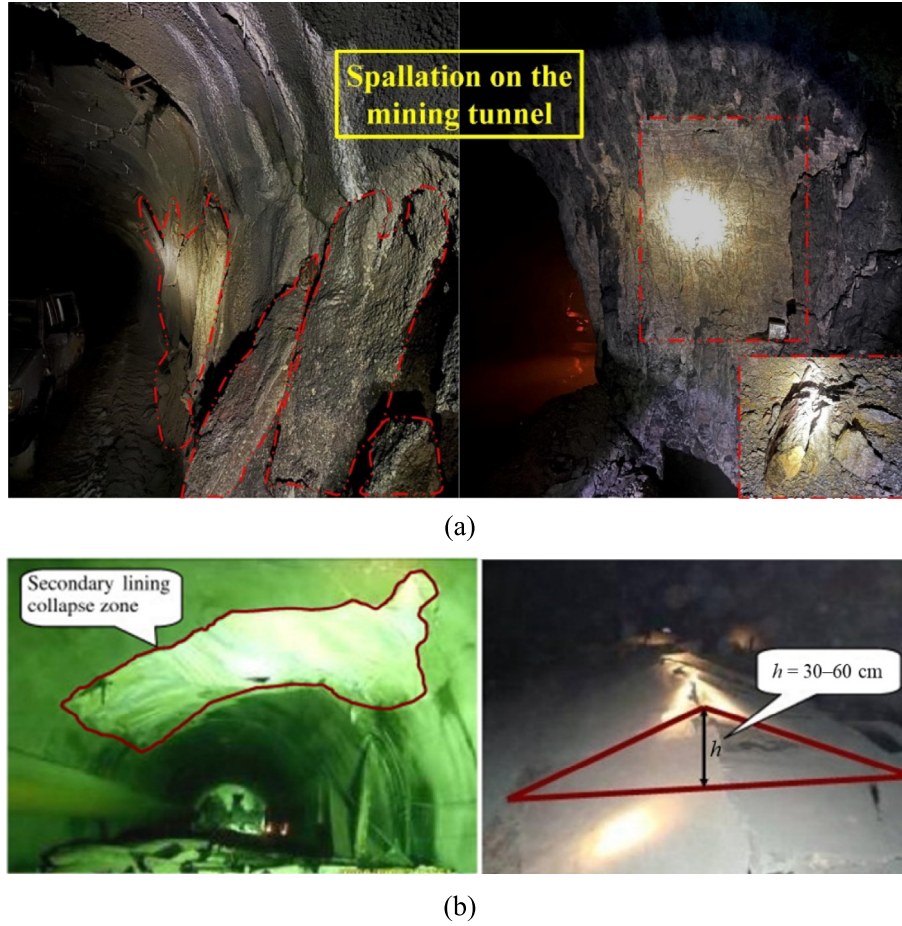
Damage characteristics of tunnels in actual engineering projects. (a) Spallation of tunnel side in Kaiyang phosphate mine under near-field blasts (R. Zhao et al., 2023), and (b) roof collapse and floor uplift of tunnels after Wenchuan earthquake (Shen et al., 2014).
